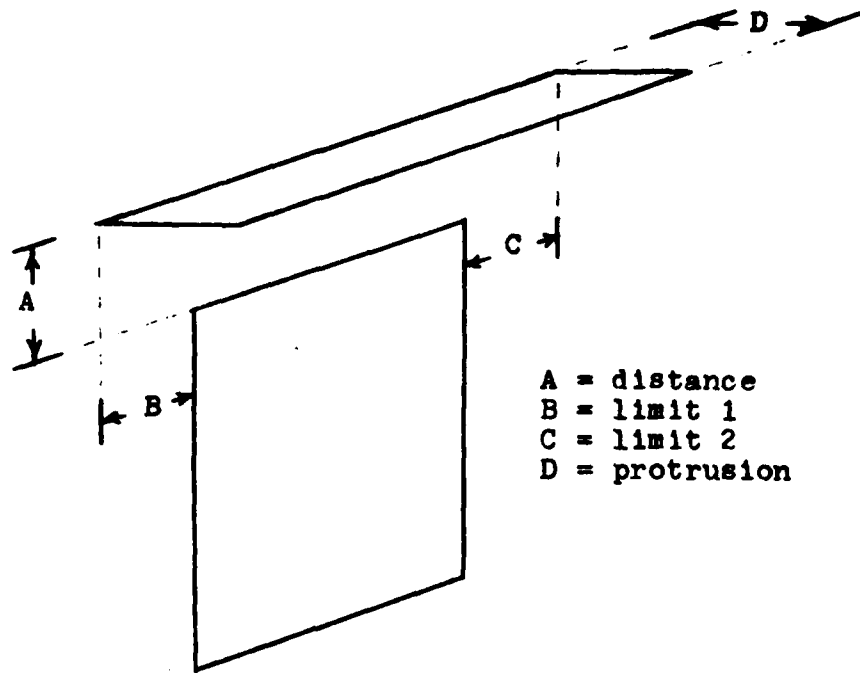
Barrier # 2 (overhang). Bottom sketch is outside view of wall from a distance. Top sketch is a close-up view. Remember that barriers are always perpendicular to the wall.
